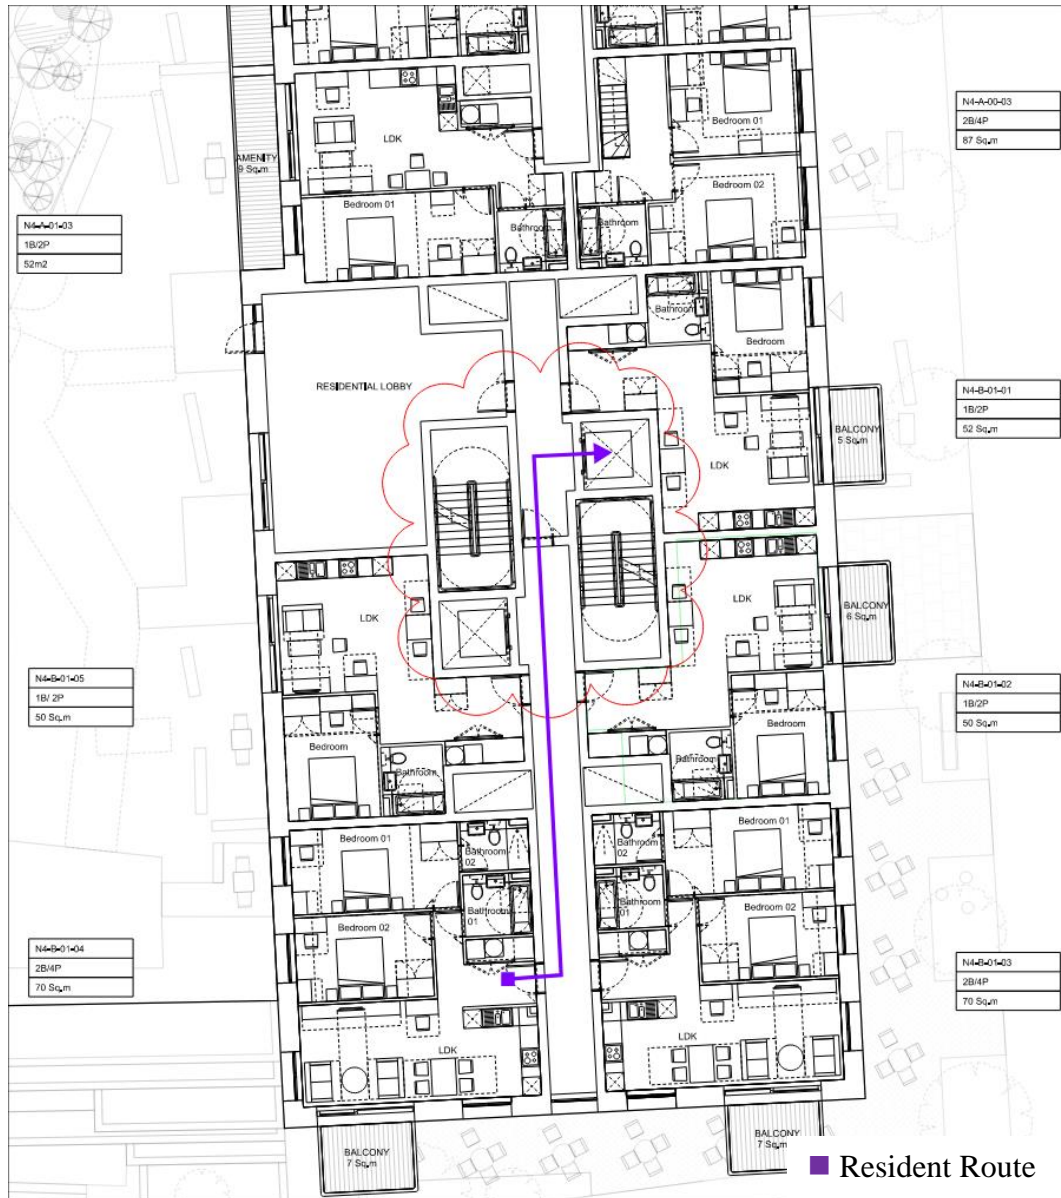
Longest residential waste conveyance route N4-B (typical upper floor)
